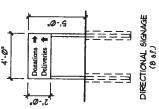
### EXHIBIT H: PRELIMINARY SIGNAGE PLANS
